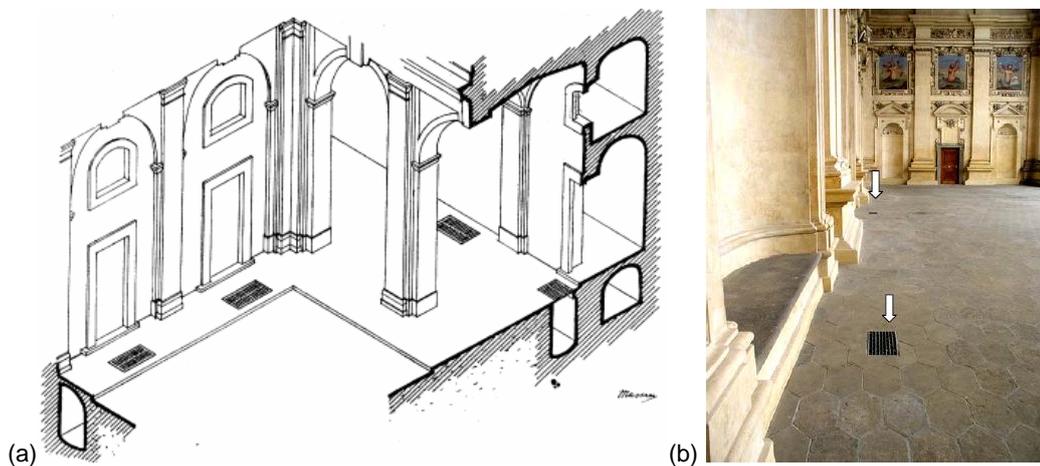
(a) Cross section illustration showing typical ventilation channel around foundation found in Baroque buildings (b) Corresponding ventilation vents around channel – (*Traditional historical technologies for moisture proofing of buildings, (n.d.)*)
